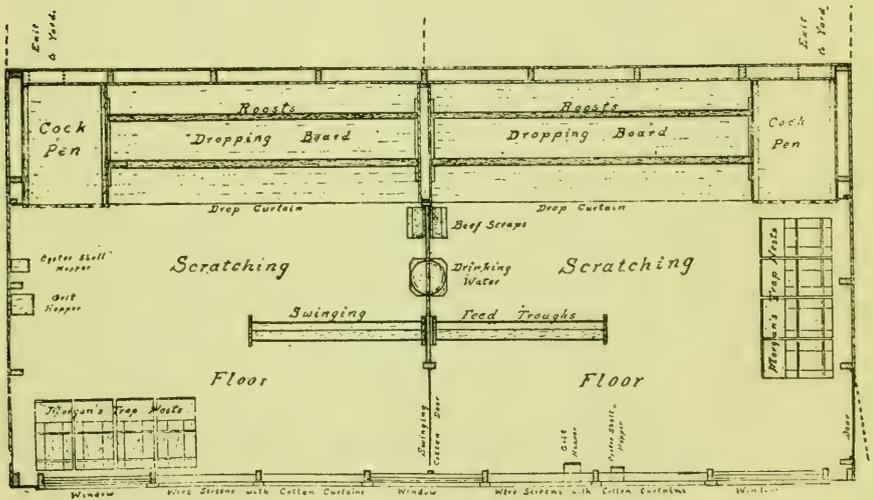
Floor Plan of Successful Canadian Poultry House. See Fig 9.
